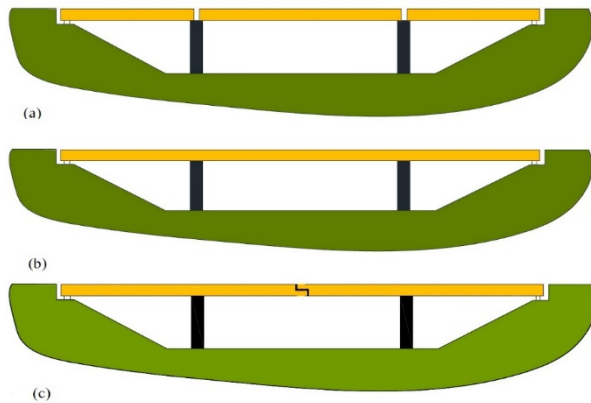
(a) simply supported bridge, (b) continuous bridge, (c) cantilever bridge
